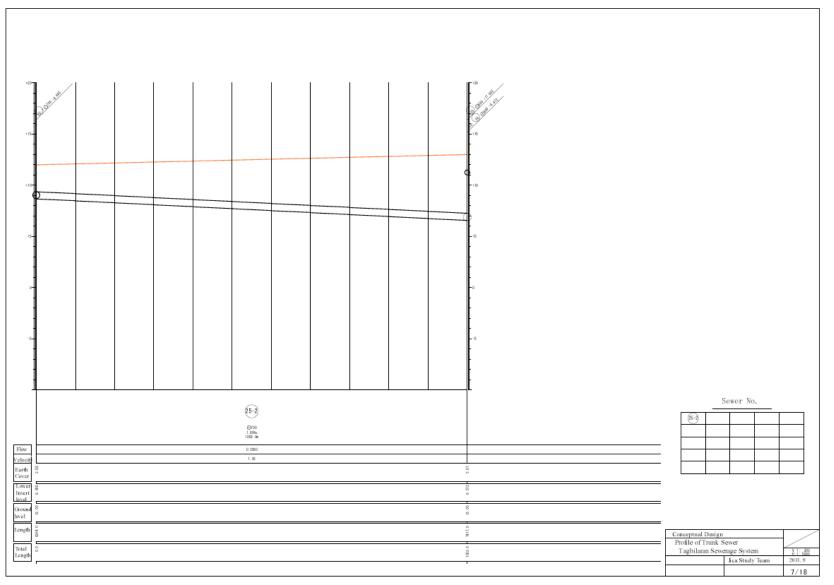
Profile of Trunk Sewer (Tagbilaran Sewerage System)
